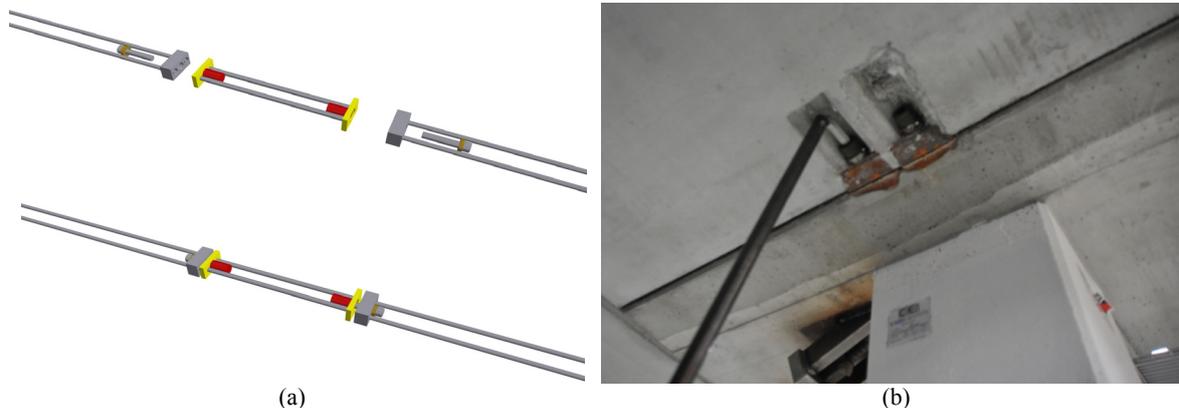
(a) Loosen and activated connection system in its bare configuration. (b) Activation of the loosen bolts to provide continuity to the longitudinal bars crossing the beam-column joint.
